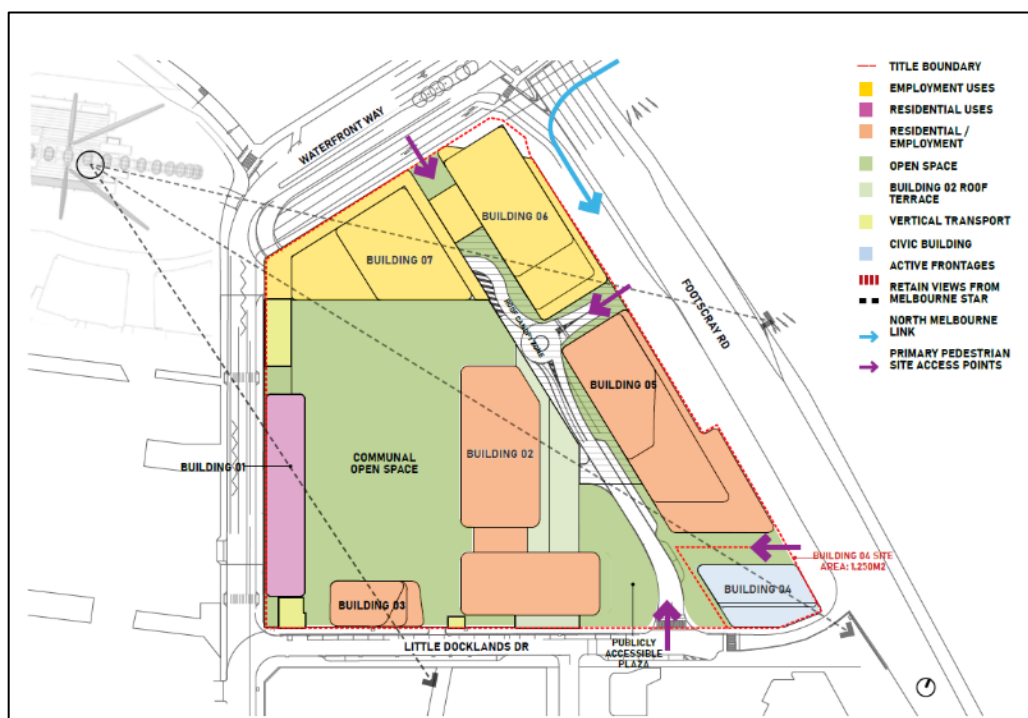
Precinct Plan associated with the Waterfront City East Development Plan 2022 (source: The Development Plan)
